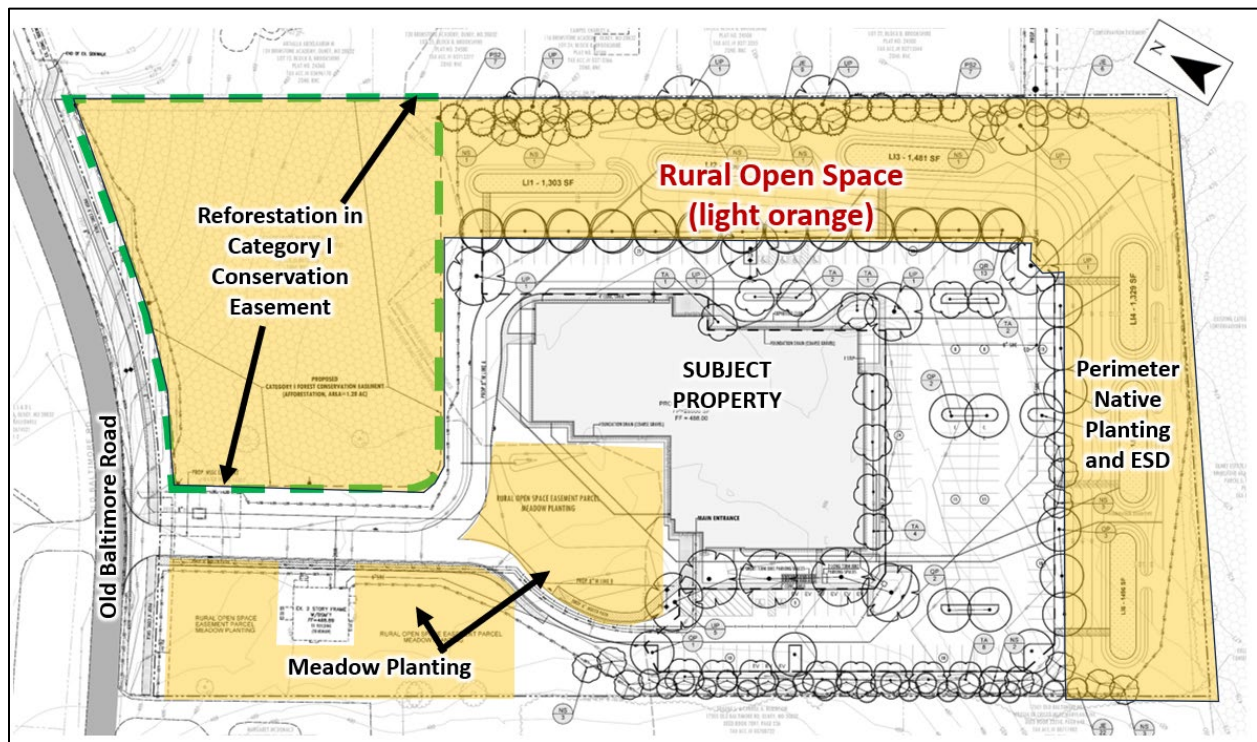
Preliminary Plan showing Rural Open Space and Landscaping
